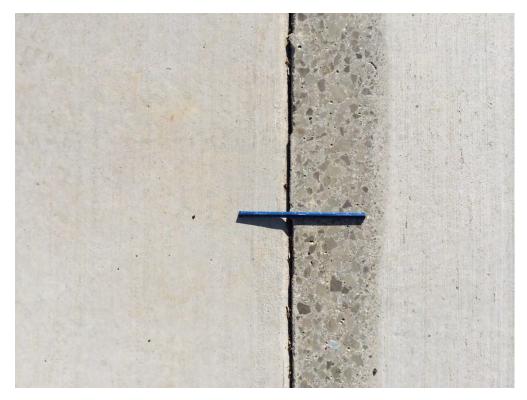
Example of extension crack not considered due to shaved concrete [[NSF-GEER; N 38.3021 W 122.3430; 8/28/2014 09:17]
